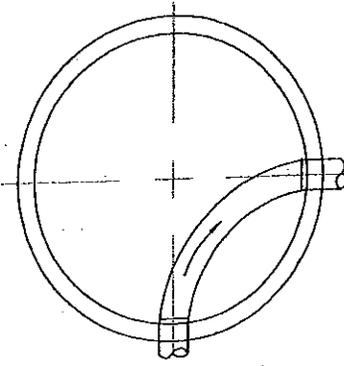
NEW MANHOLE ON EXISTING LINE
